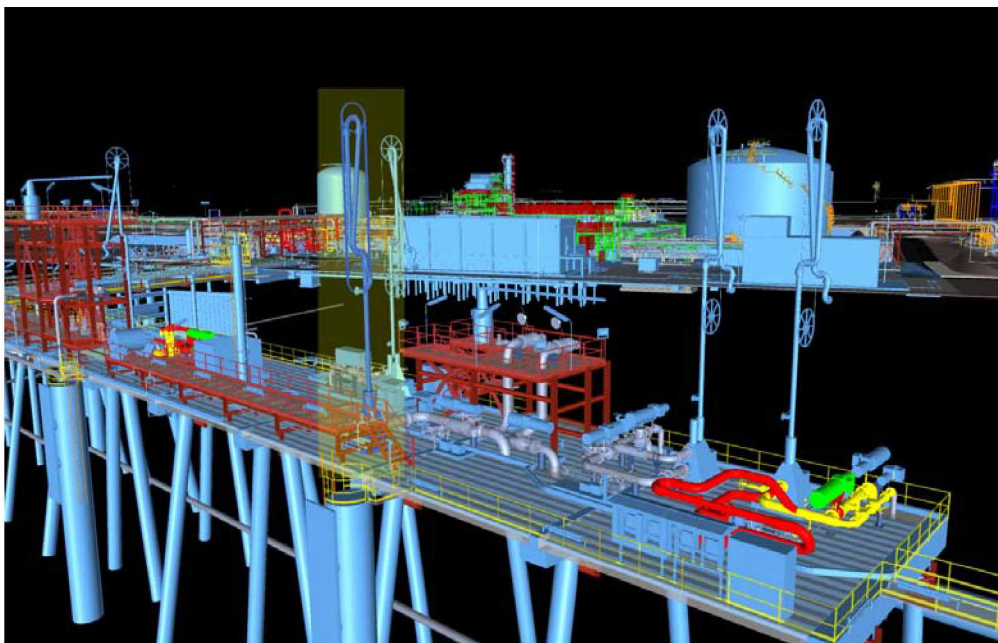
Installation of new loading arm on Jetty 1 (Unit 045)
